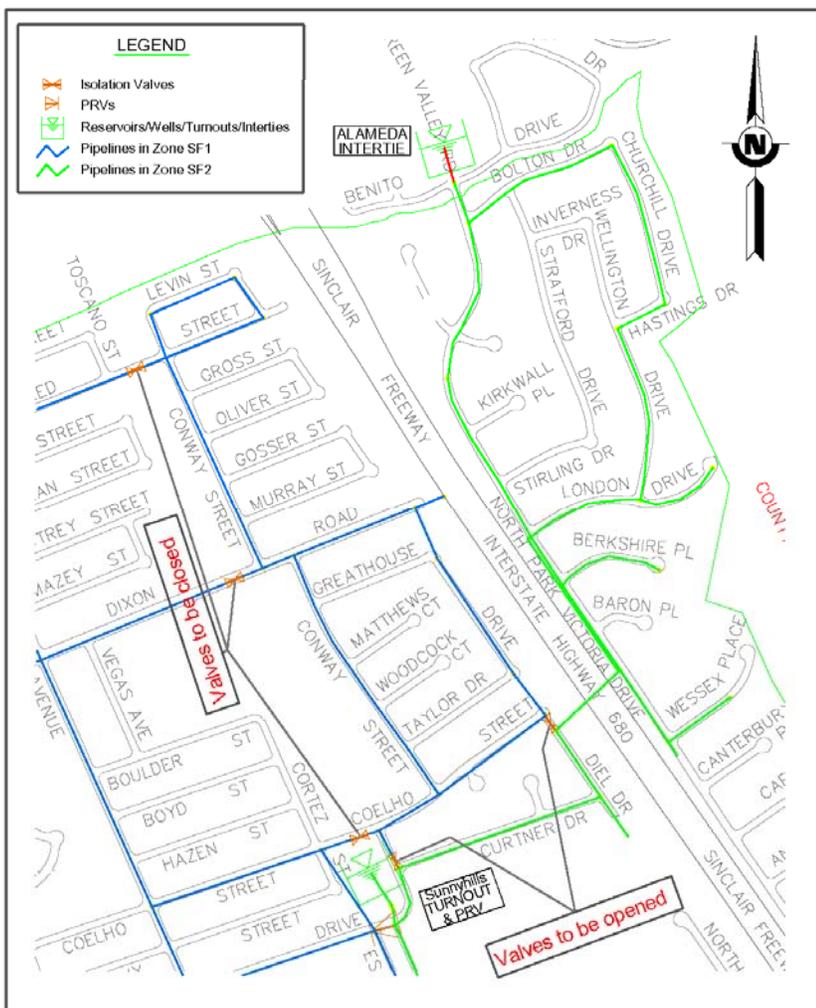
Project No. 1 – Dixon Road and Levin Street
